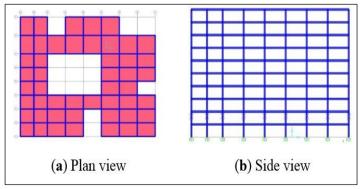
Plan and side view of isolated building. Source: Authors, (2020).
